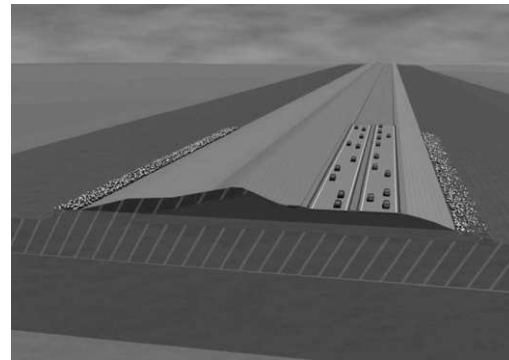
Outerward reinforcement for 1 l/s/m overtopping and a 10 m wide outer berm.
